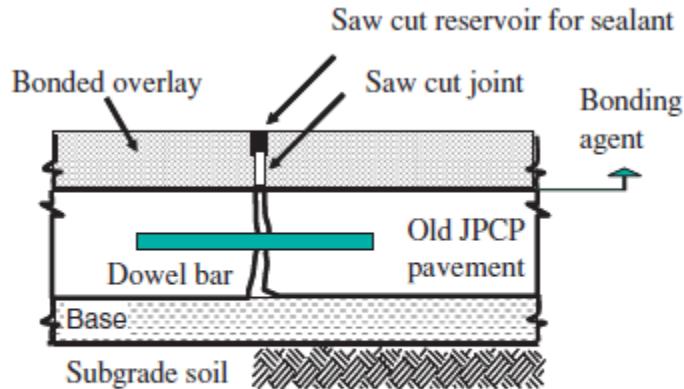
Cross section of bonded overlay of jointed plain concrete pavement
